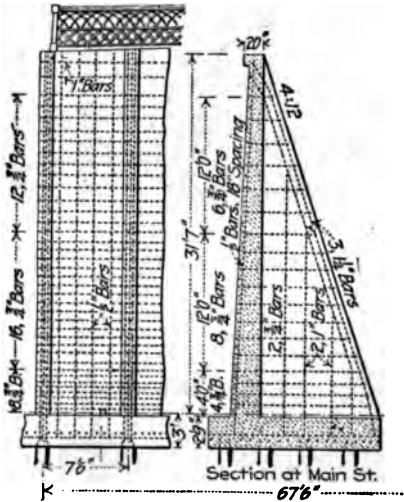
A.—Retaining Wall, Great Northern Ry., Seattle, Wash.
